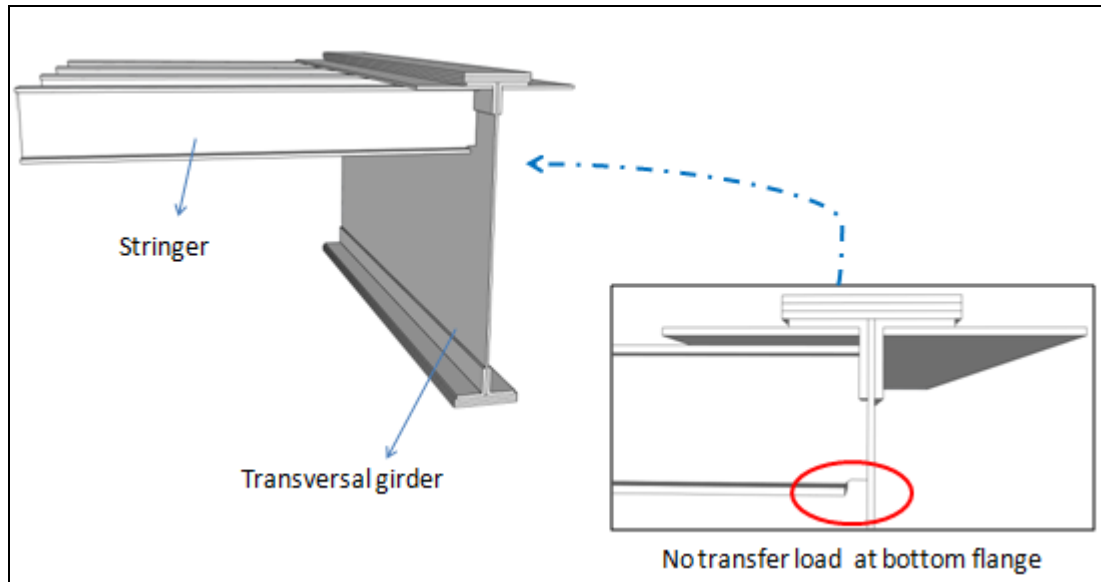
Illustration of how the connection between stringers and transversal girder was modelled in Abaqus.
